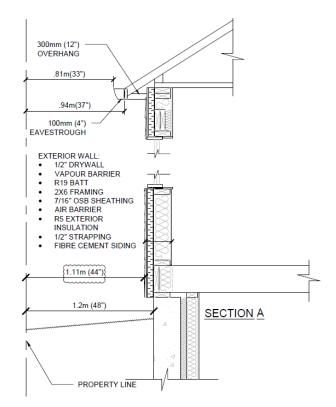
Partial wall section at the 1.2m setback indicated on the site plan.
